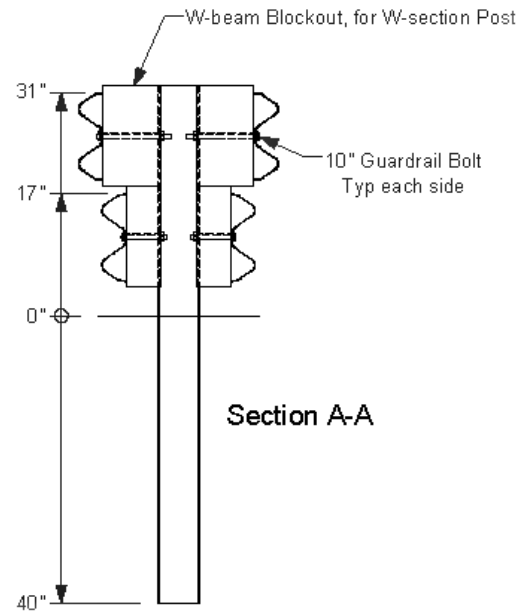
Cross-Section of Modified TxDOT Median Guardrail Transition to Concrete Parapet.
